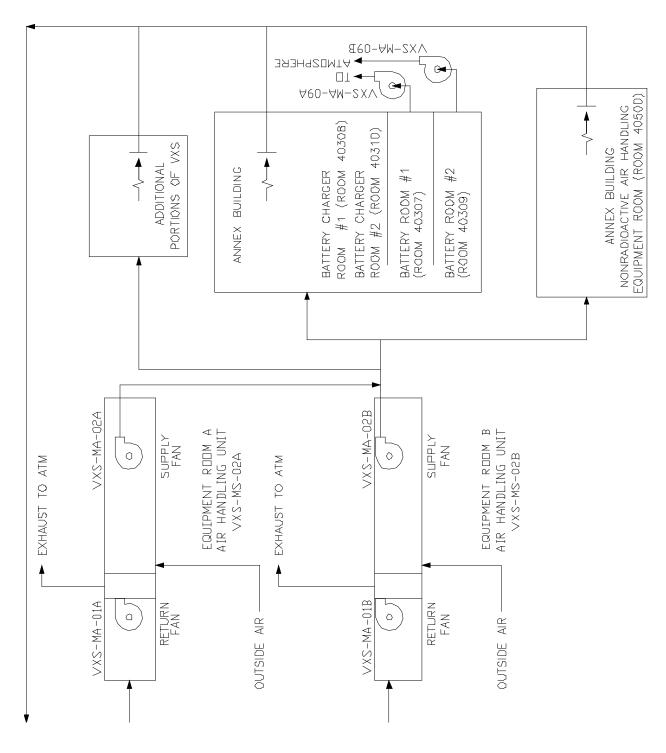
(Sheet 2 of 2) Annex/Auxiliary Building Nonradioactive Ventilation System
